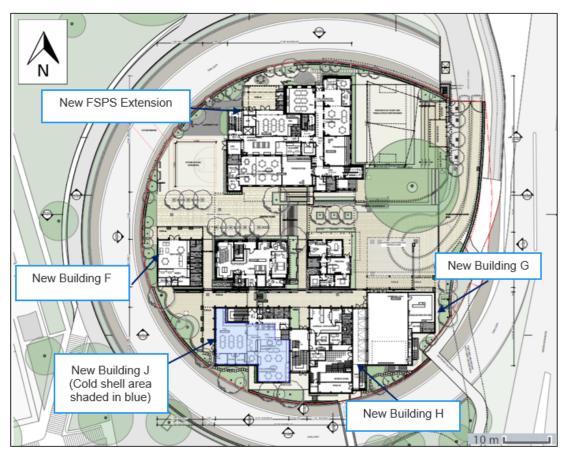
| Level 1 (ground floor) (Source: Applicant's EIS 2020)
